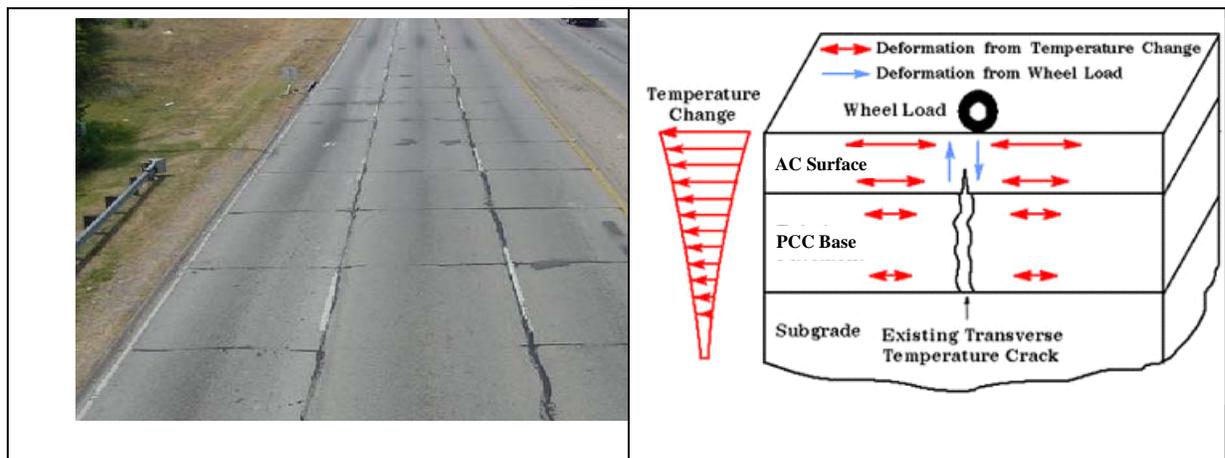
Reflective Cracking in HMA Overlays of PCC Pavements.
